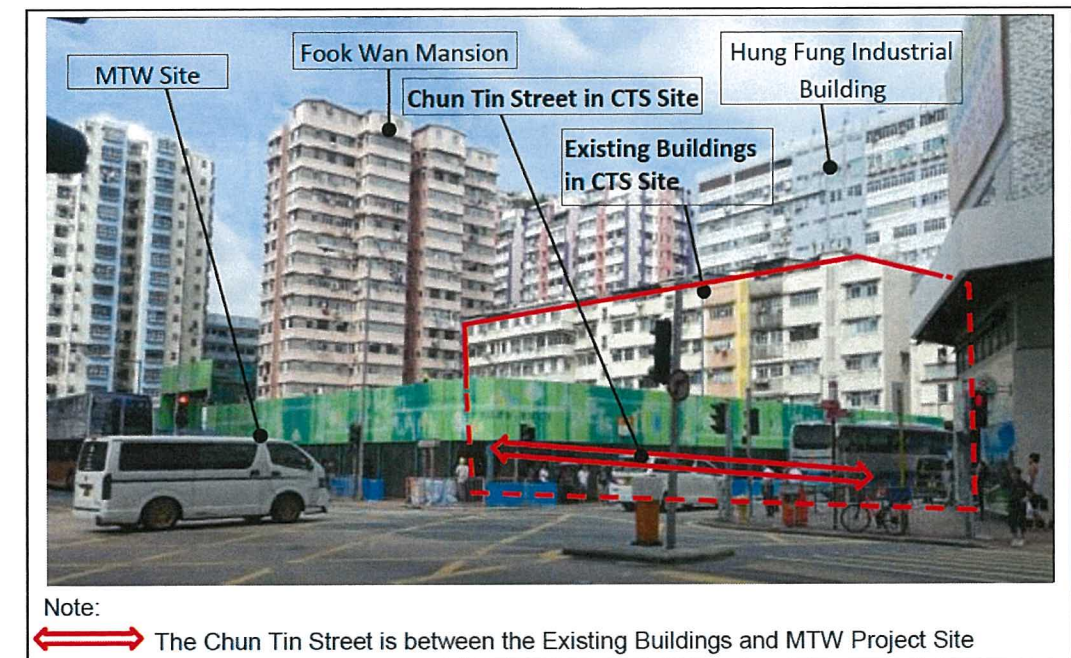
Ma Tau Wai Project (MTW) and Existing Old Buildings on Chun Tin Street (CTS) Still In Place, View From Ma Tau Wai Road / Hok Yuen Street Junction
